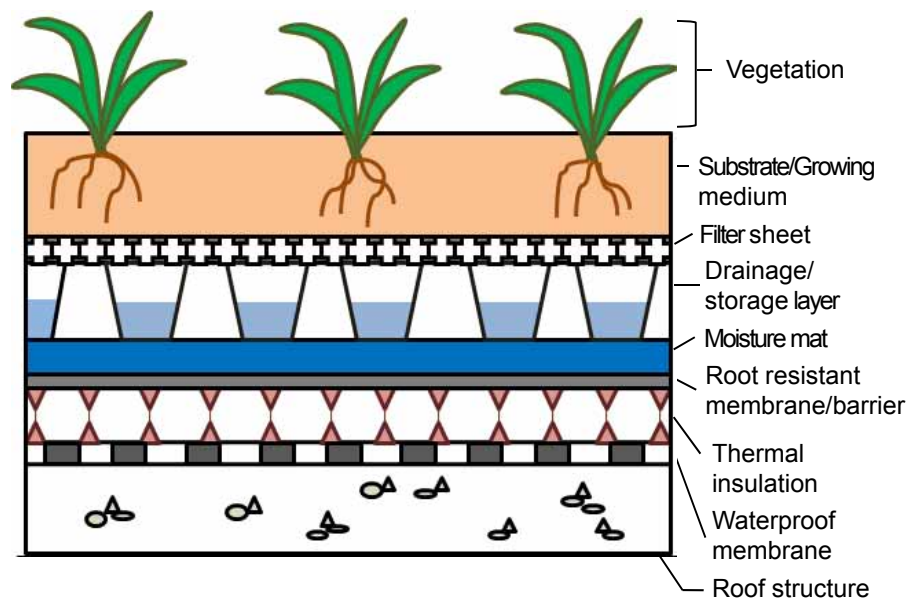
Typical structure of extensive green roof (Hui, 2009)
